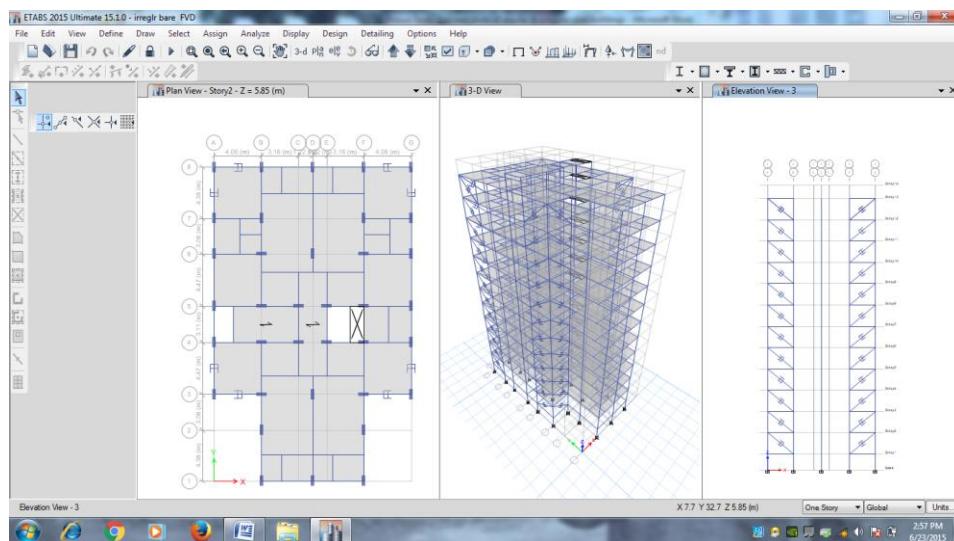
Plan, 3D model and Elevation of bare frame with fluid viscous dampers for irregular plan
